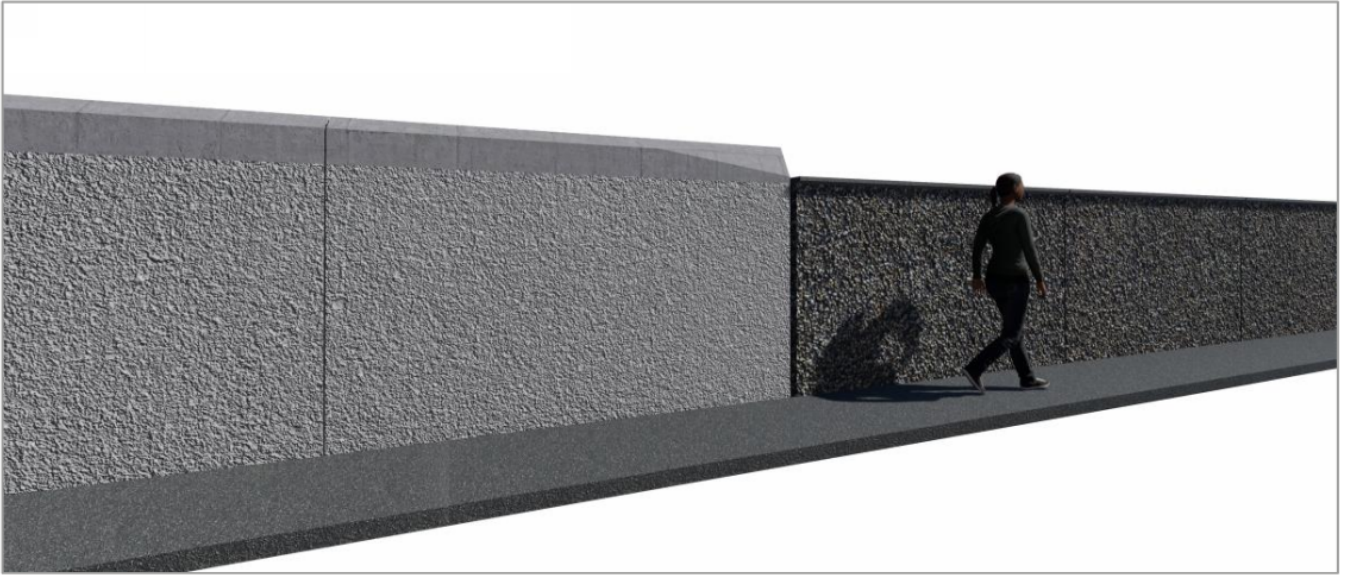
Rendered view of transition between the existing (to the right) and proposed (to the left) Granby Terrace Bridge parapet walls, looking north-east
